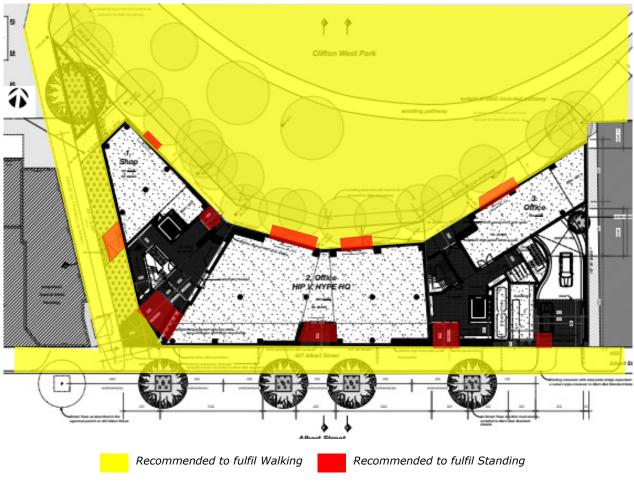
Ground floor plan with recommended wind criteria overlaid.
